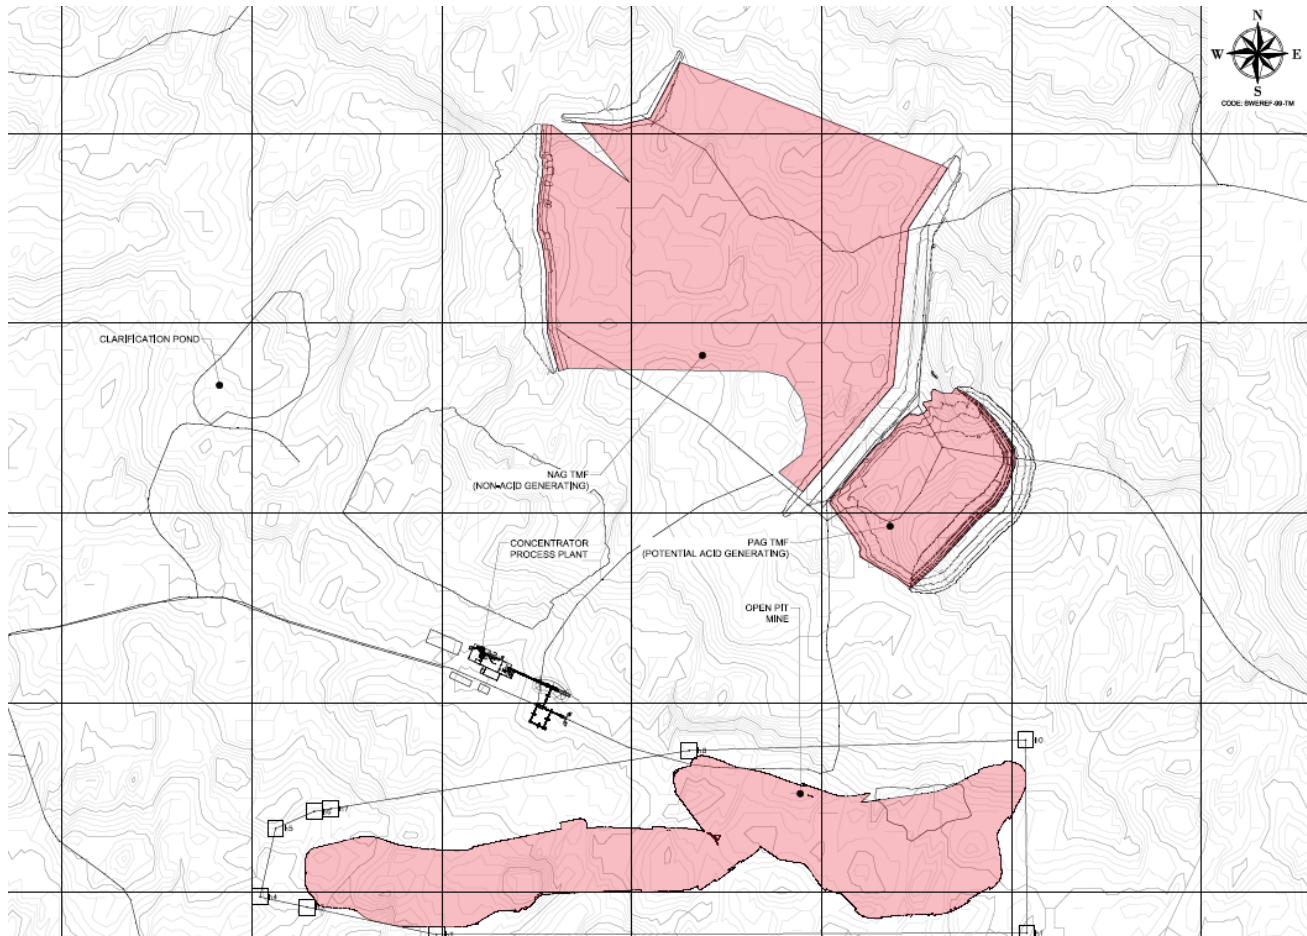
Site plan for the Kringel Mining and Beneficiation facilities
